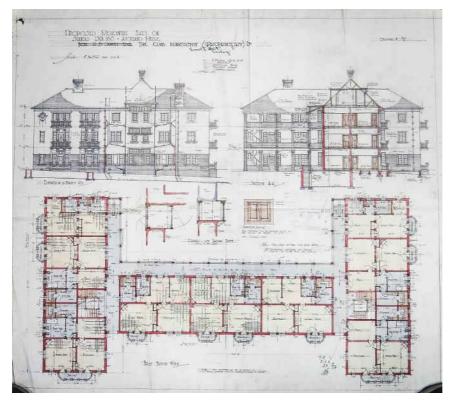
Original plan for proposed residential flats along Kingsway Avenue from 1928_plans were drawn by the well-known architect P. Rogers Cooke (Source: City Council of Johannesburg, Plans Archive)
